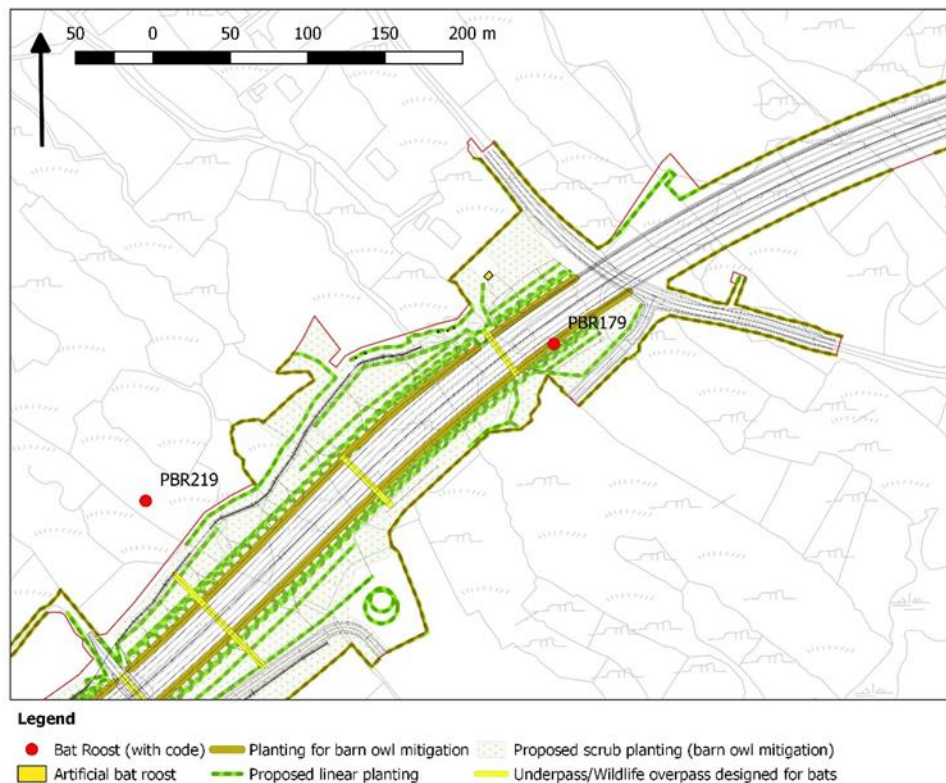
Proposed Location of Menlough Woods Artificial Night Roost Structure
